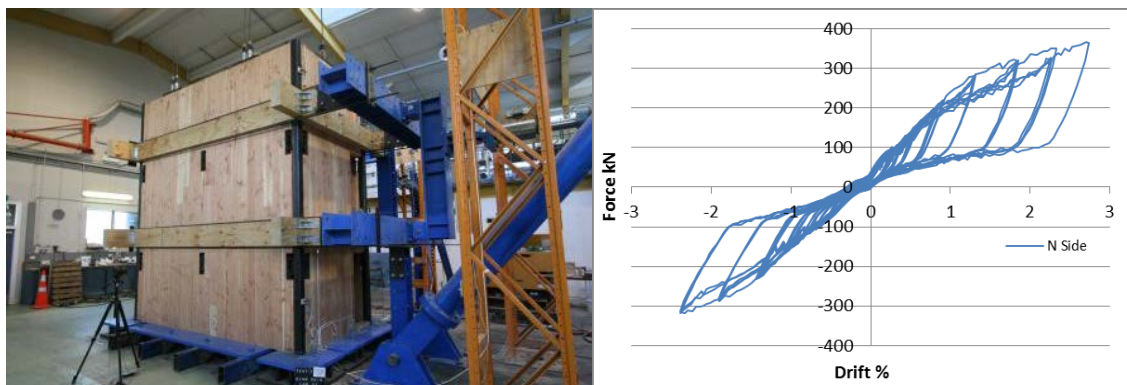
CLT shear wall test specimen and load-deflection plot [29]
